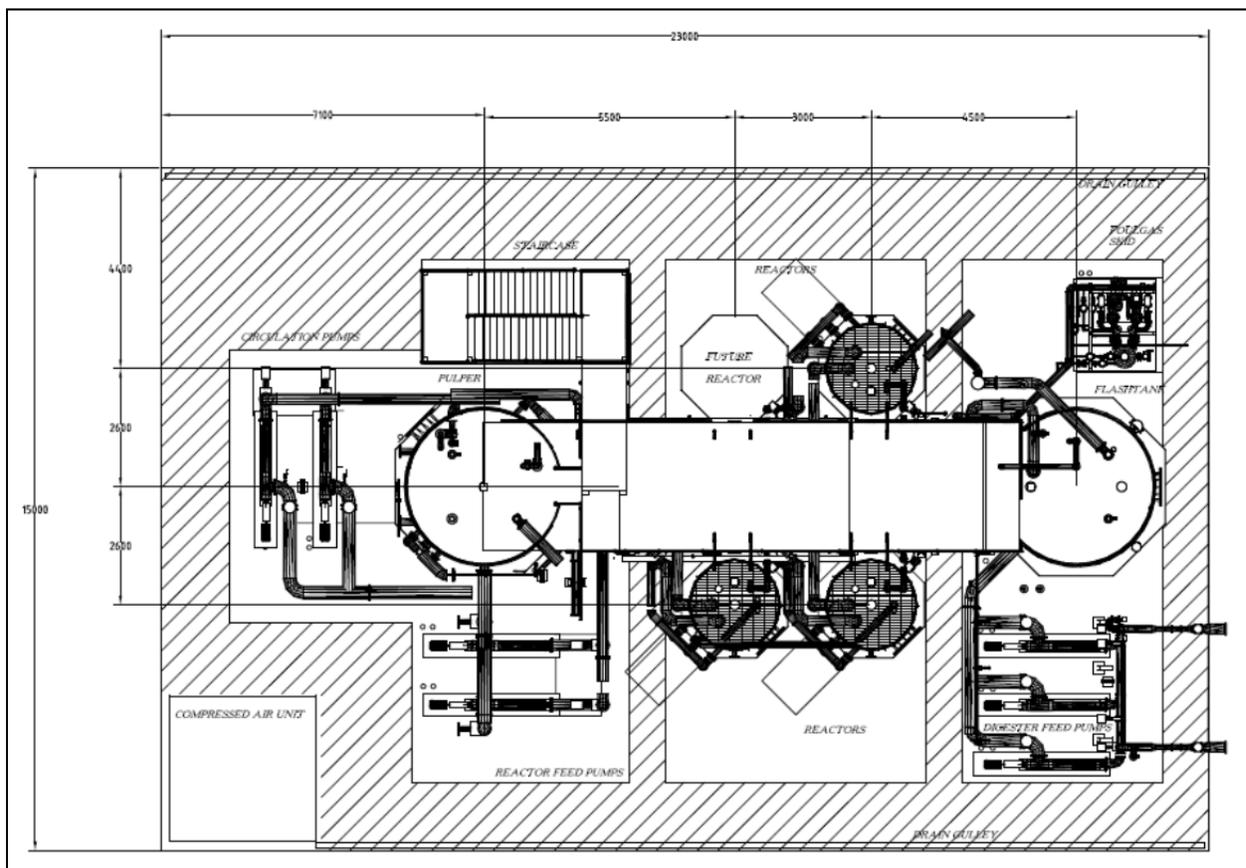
Proposed Layout of Thermal Hydrolysis Equipment (image courtesy Cambi)
